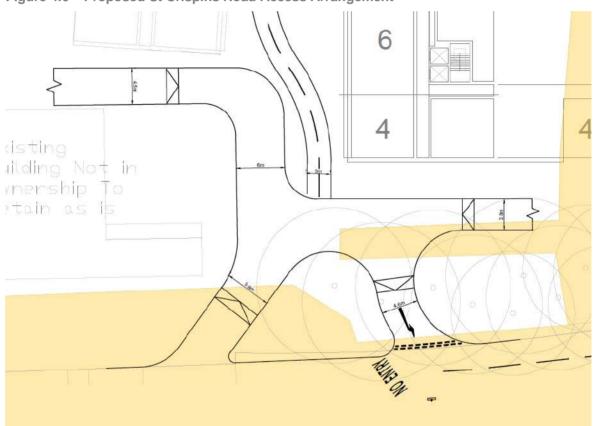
Proposed St Crispins Road Access Arrangement
